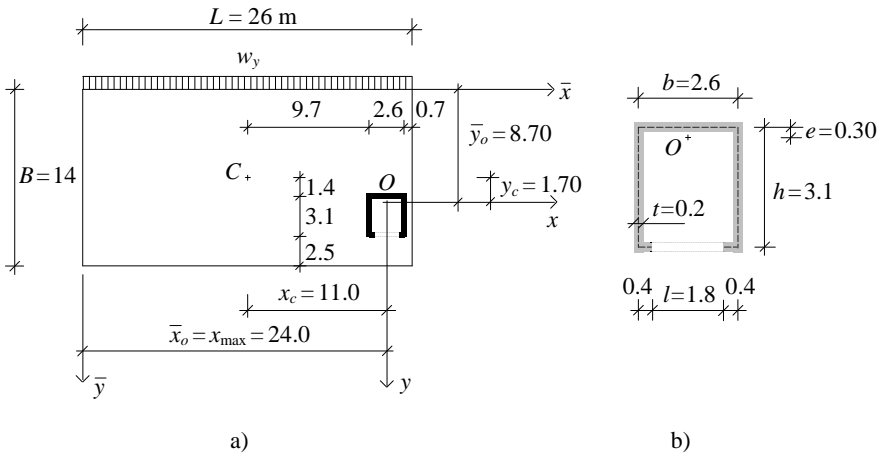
Kollár's building. a) Layout C, b) Partially closed core.
